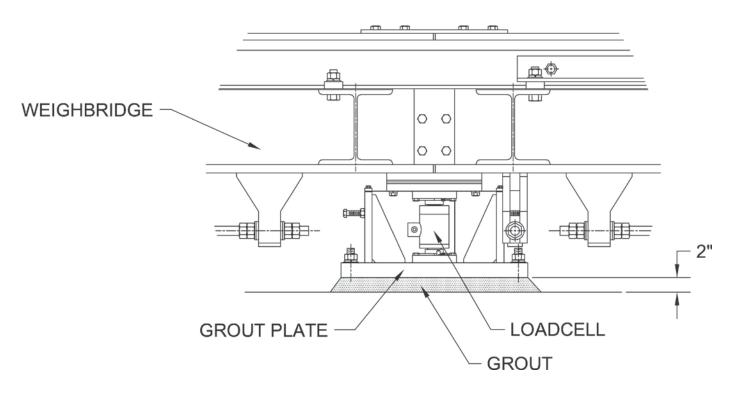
Grout Plate and Load Cell Spacer Installation
